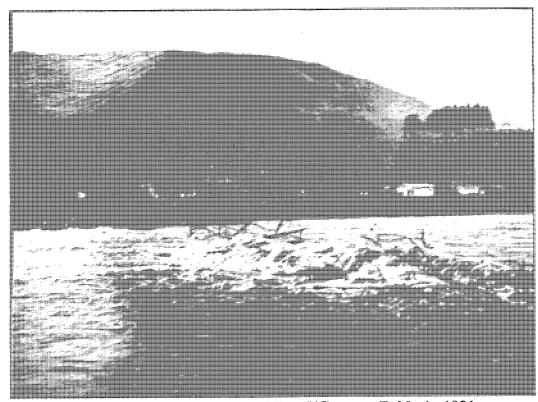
Manor Park Bridge (Ford Road/Georges Bridge), 1931.
